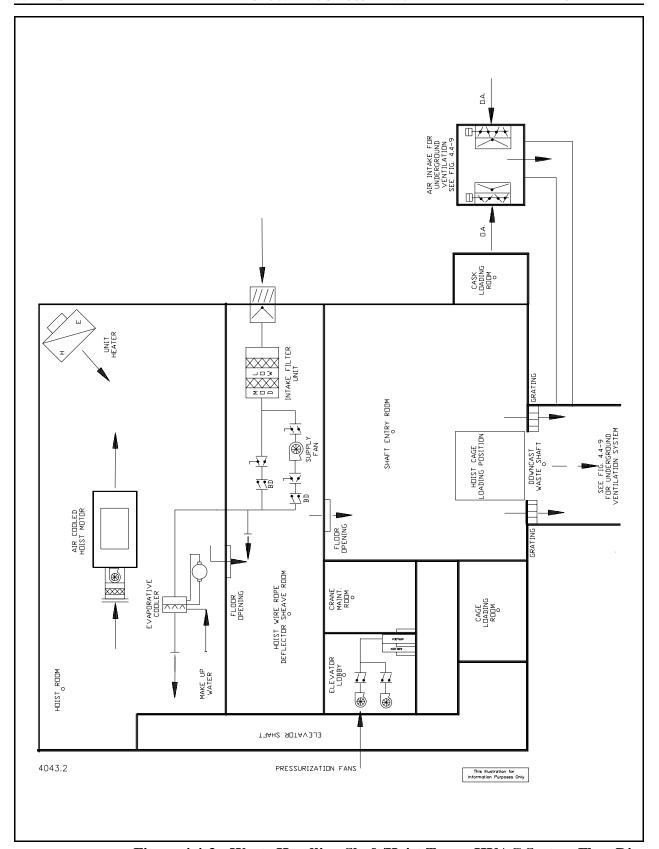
, Waste Handling Shaft/Hoist Tower HVAC System Flow Diagram
